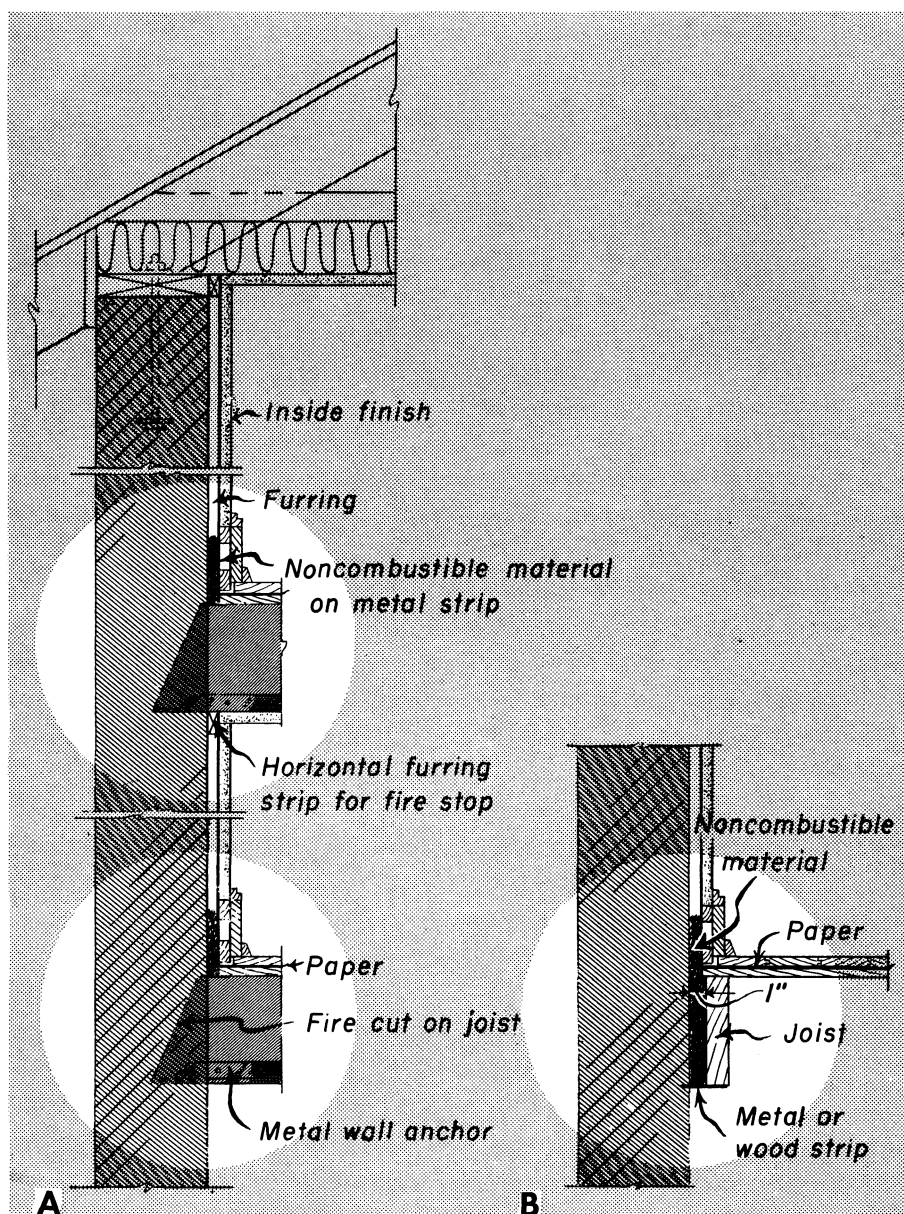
If a building has masonry walls, the spread of fire in the flooring and wall finishing can be retarded: A, By providing firestopping between the masonry and the inside wall; or B, by setting the joists that run parallel to masonry walls 1 inch from the wall and packing the space between with noncombustible material.
